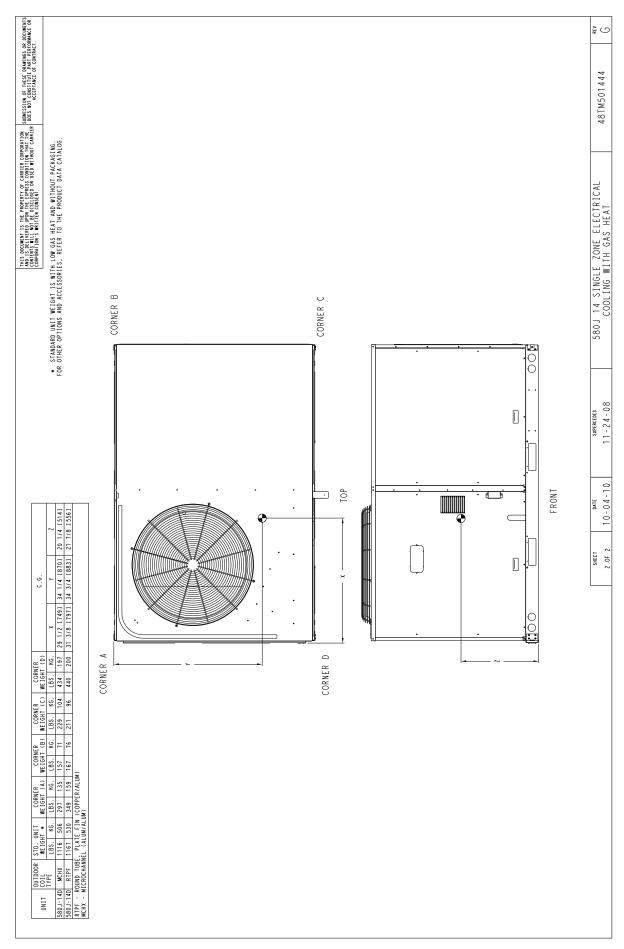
Unit Dimensional Drawing Size 14 (cont)
